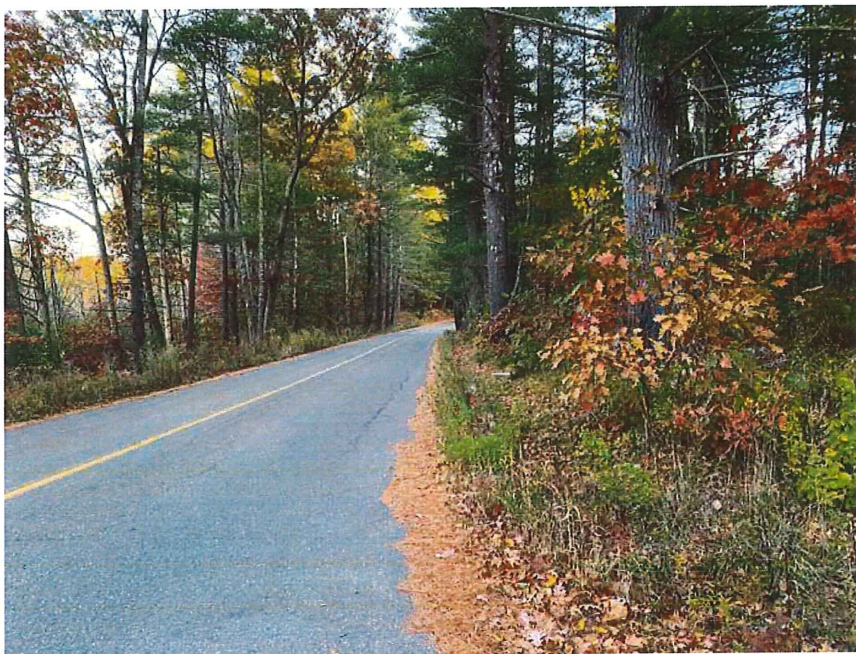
Sight Distance – Hoyts Wharf Road – Facing Southeast
